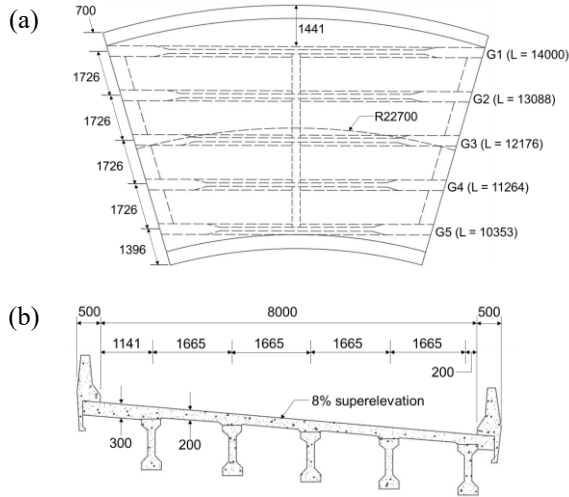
Geometry of bridge superstructure; a) Plan and b) Typical cross-section (Unit: mm)
